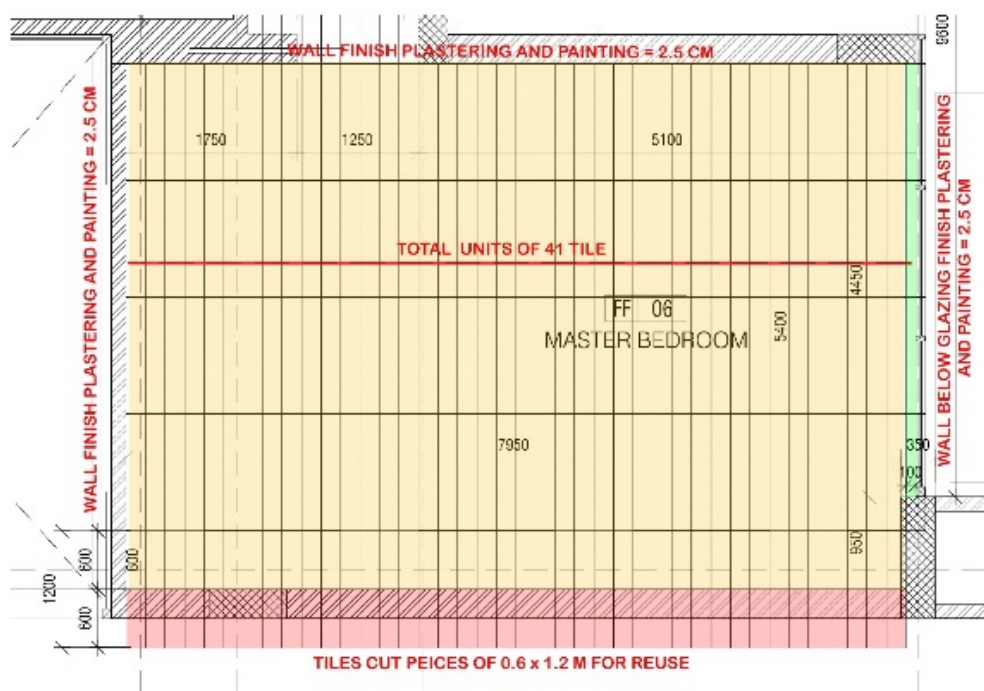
Illustration of tiles consideration of wall finishing using BIM Autodesk Revit.
